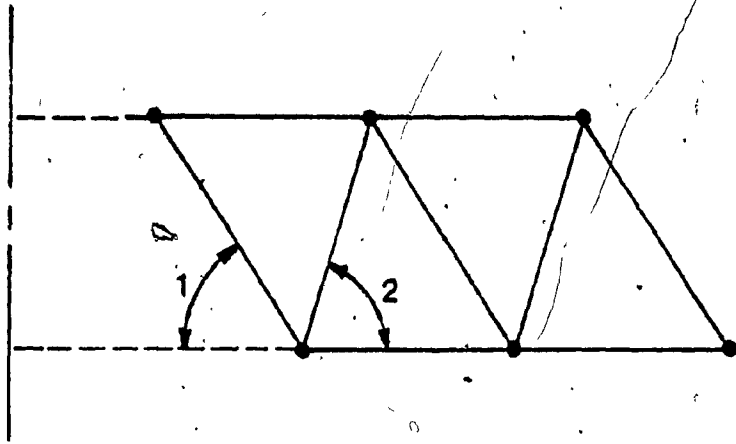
VERTICAL SECTION THROUGH THE RING TRUSS.
